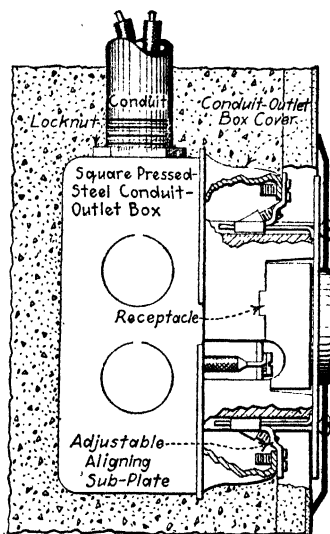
Showing a square pressed-steel conduit box used as a receptacle outlet box. This box contains a receptacle having an adjustable aligning sub-plate. (Receptacle manufactured by Harvey Hubbell, Inc., Bridgeport, Conn.)
